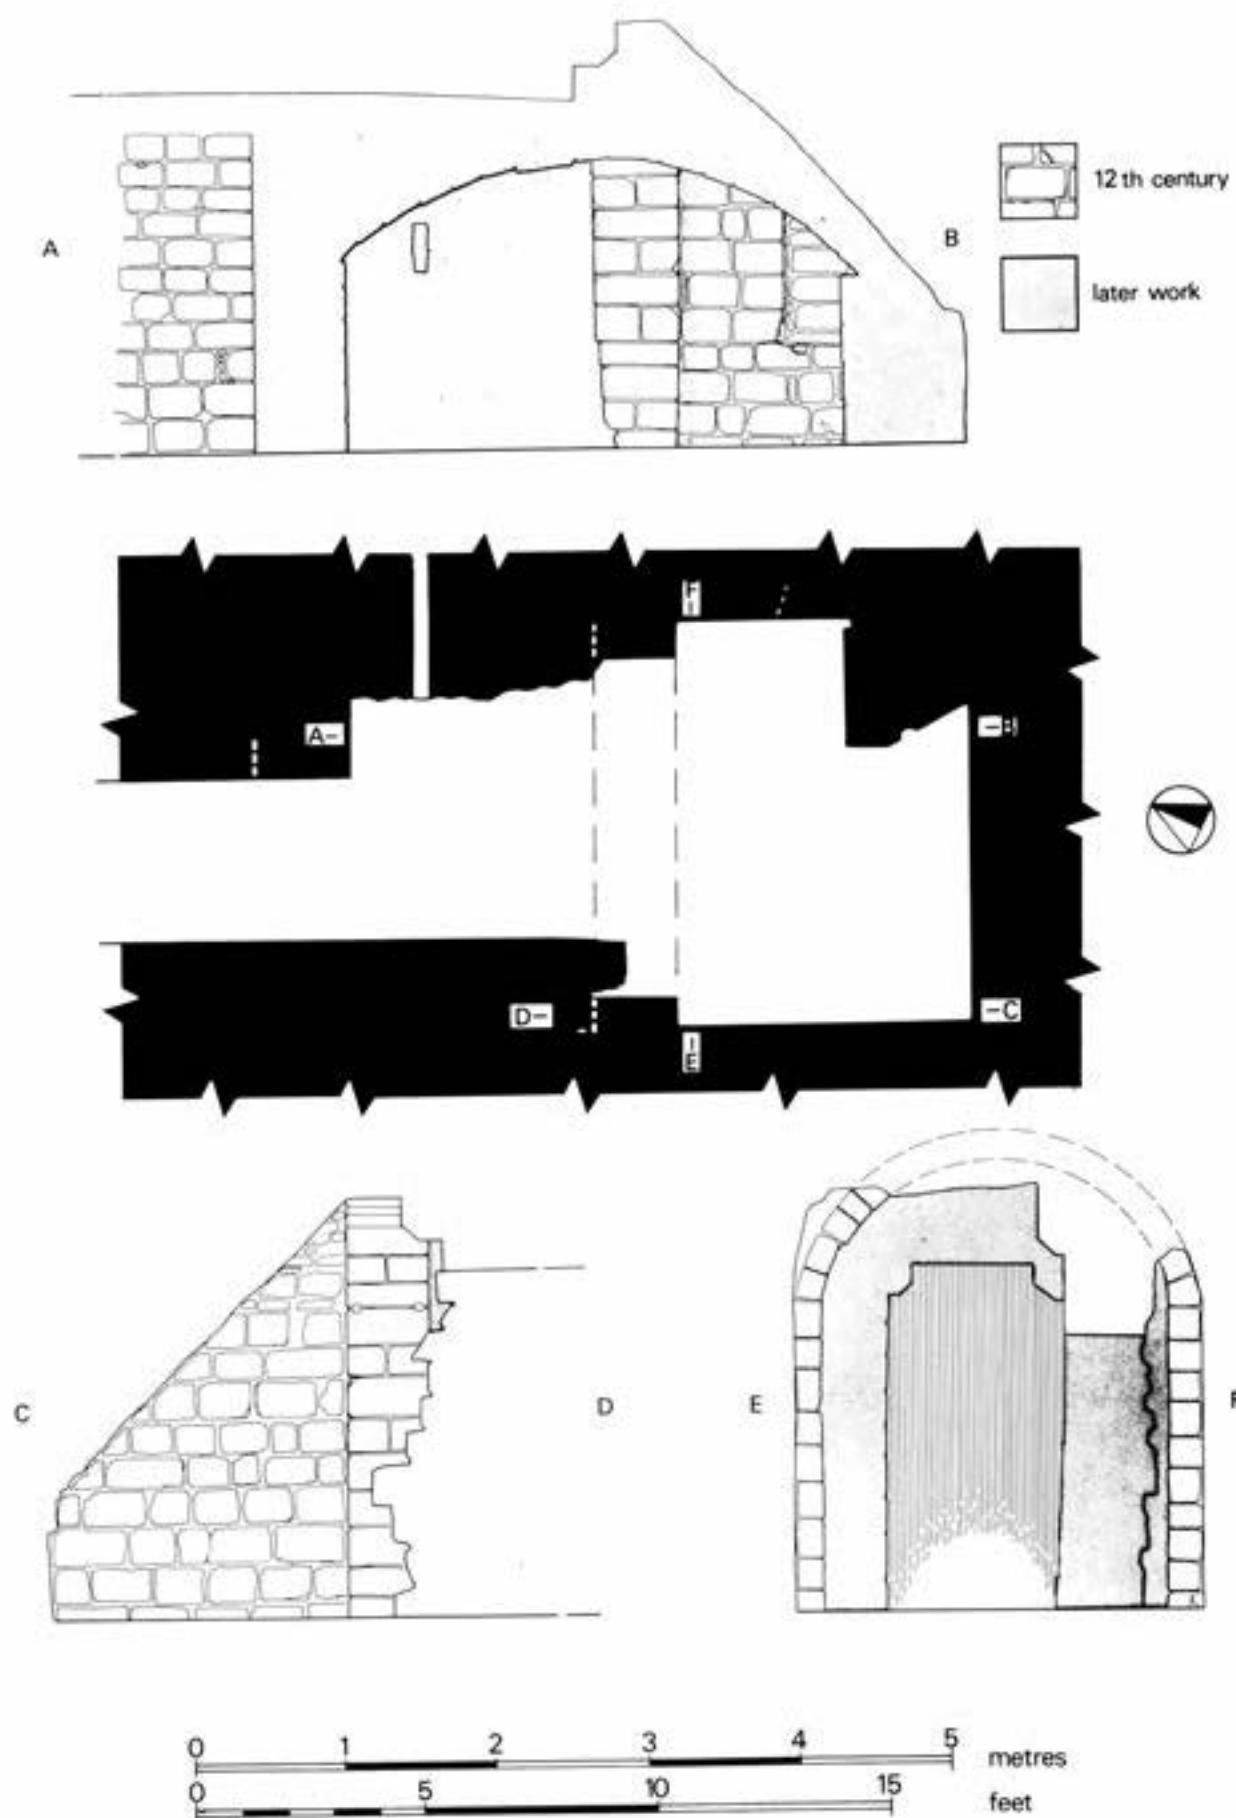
The keep; plan and elevations of the oratory (room 21) in Period 2
